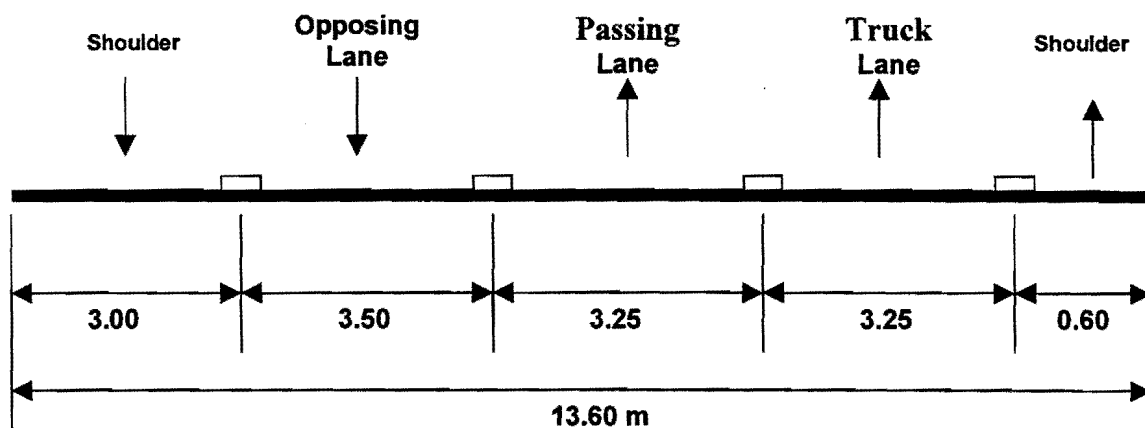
Proposed Super Two Cross-sectional Geometric Section.
